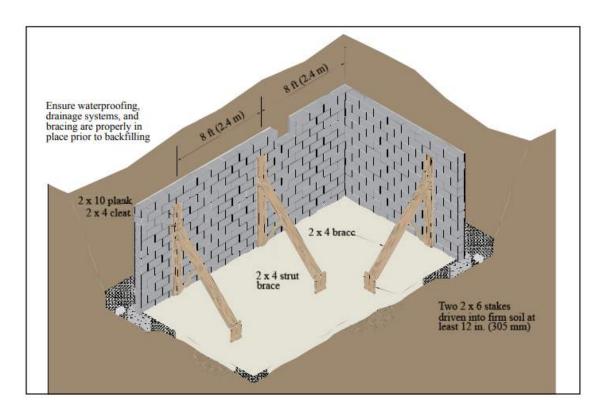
Typical Temporary Bracing for Concrete Masonry Basement Walls (ref. 6)
